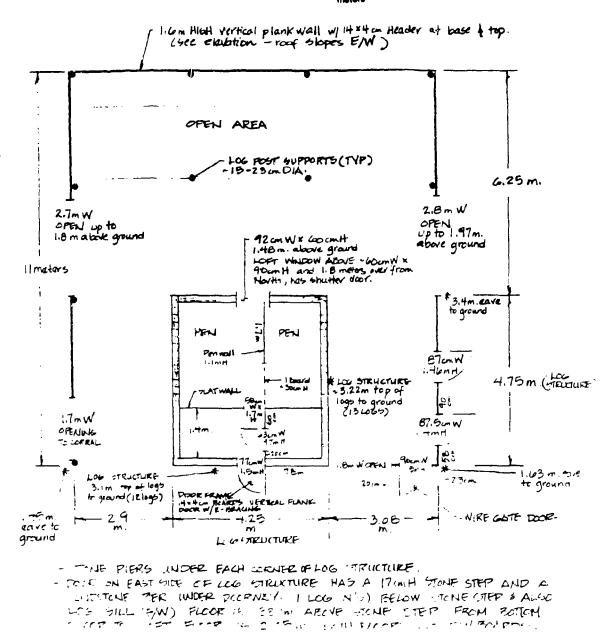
Field architectural floorplan of log crib at 41DN172.
